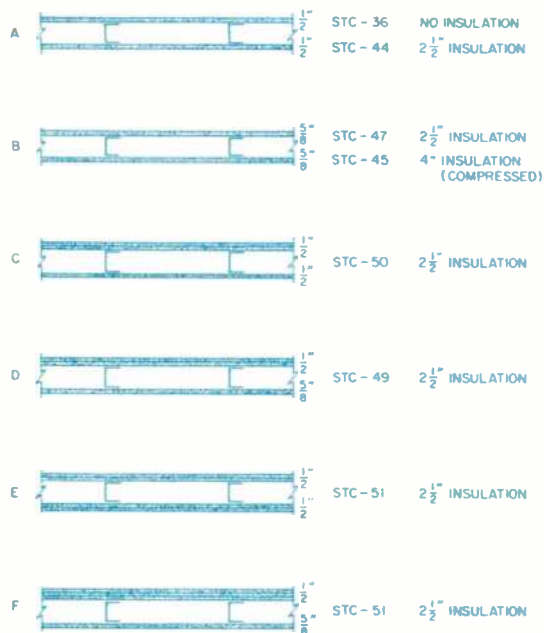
Typical walls using steel studs on 24-inch centers, and STC ratings for each. The resilience of steel studs tends to decouple the two faces of the wall; [6].
